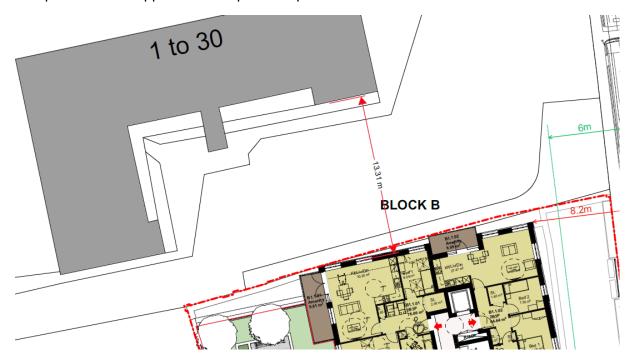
First floor plan demonstrating separation distance to Hollybush House
